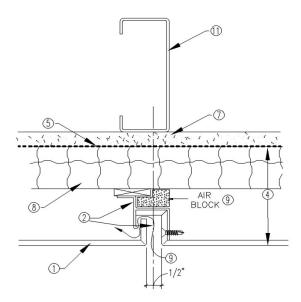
Typical vertical joint detail for rainscreen PER panel system.
